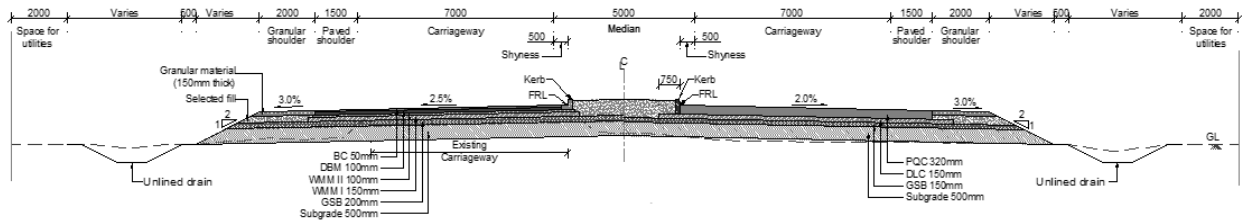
TCS 1A.4- 4 Lane Rural Area (Left Side Existing Road)
